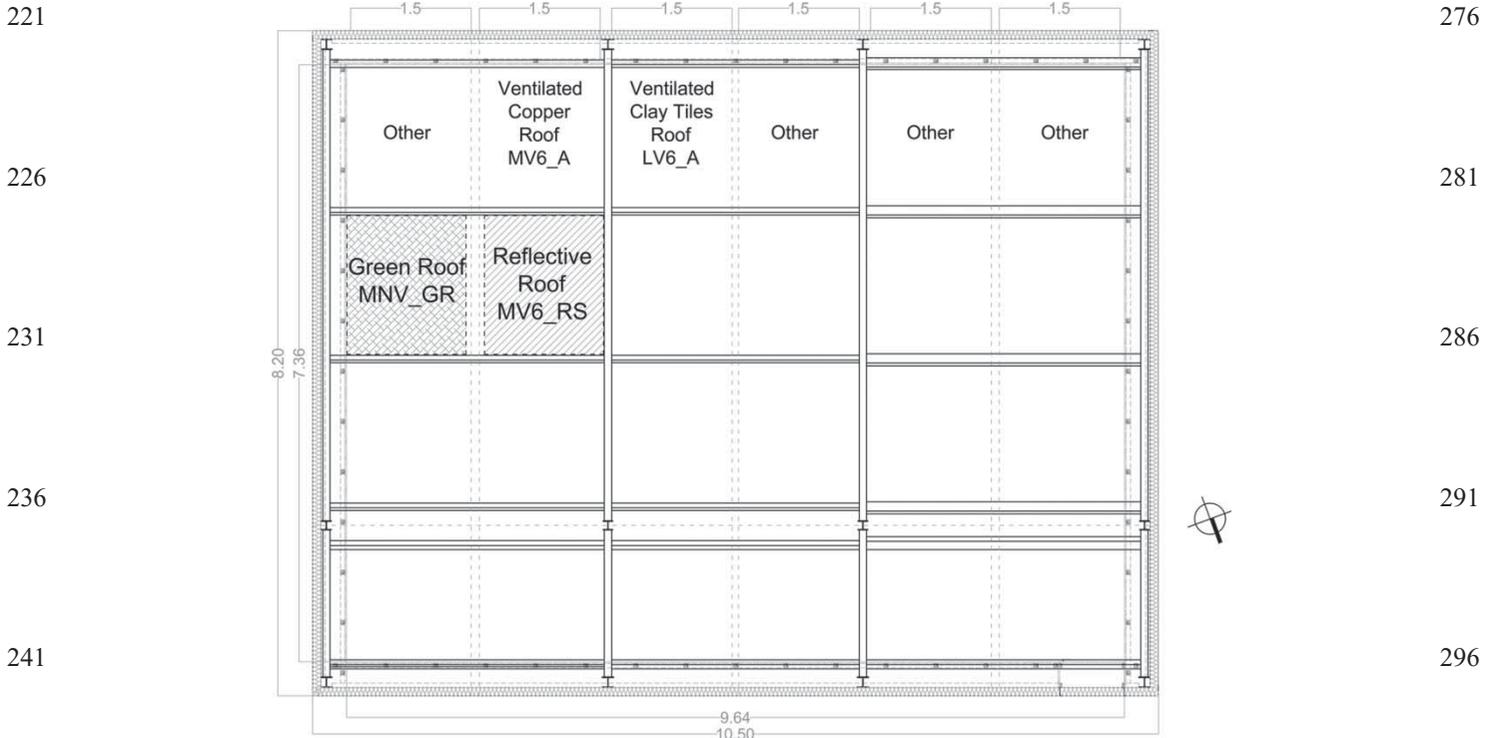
Plan of the experimental building with the schematic position of the original roofs installed in the building (ventilated clay tiles and copper roofs) and the high-albedo roofs (green roof and roof with a reflective covering) installed in 2011.
